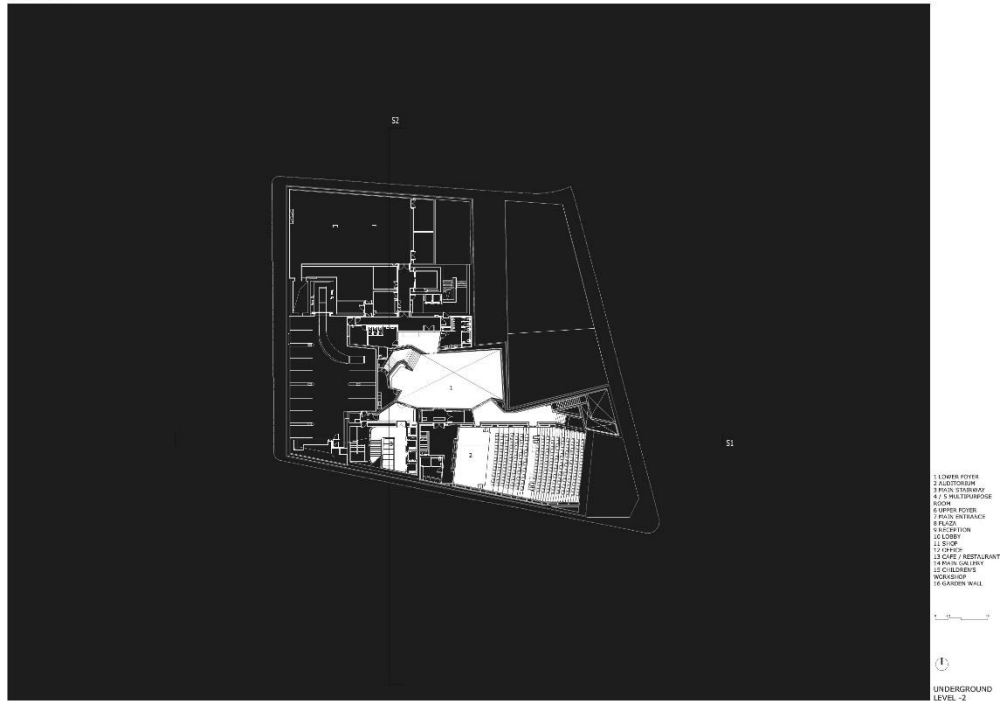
Herzog & de Meuron. (n.d.). CaixaForum Madrid – Level -2 Floor Plan [Architectural drawing].
